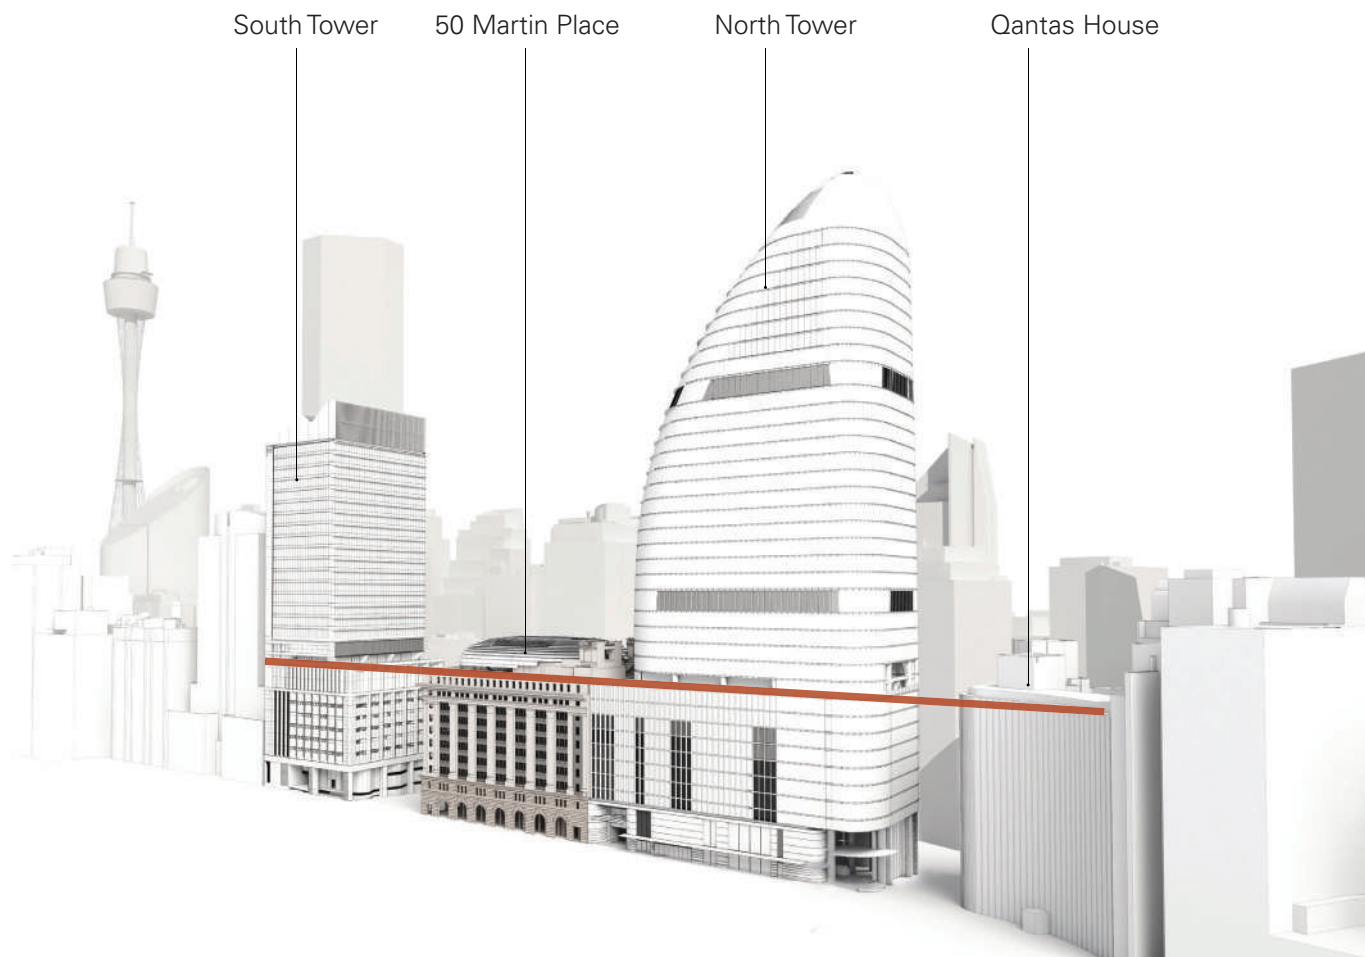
Elizabeth Street - Reinforcing key street frontage podium heights of surrounding buildings
